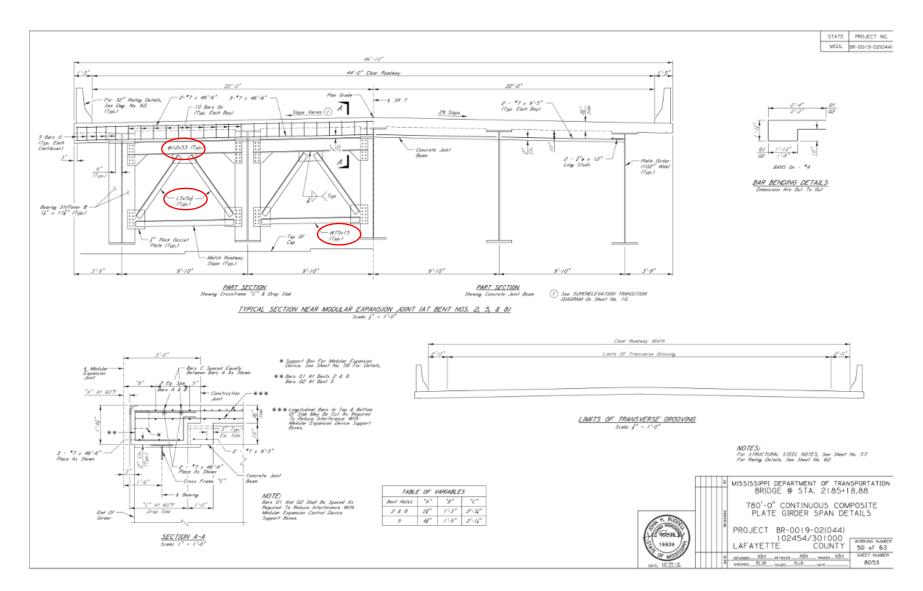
Typical sections of cross frames in the transverse direction of 780 ft girder
